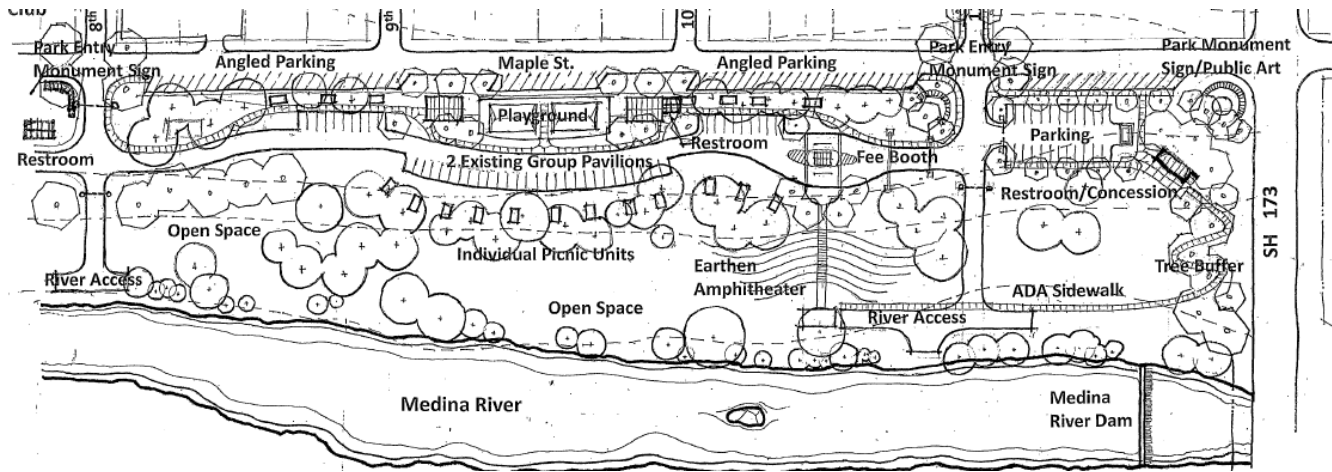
A: 2014 Bandera Parks Plan, Phase 1 Rendering
